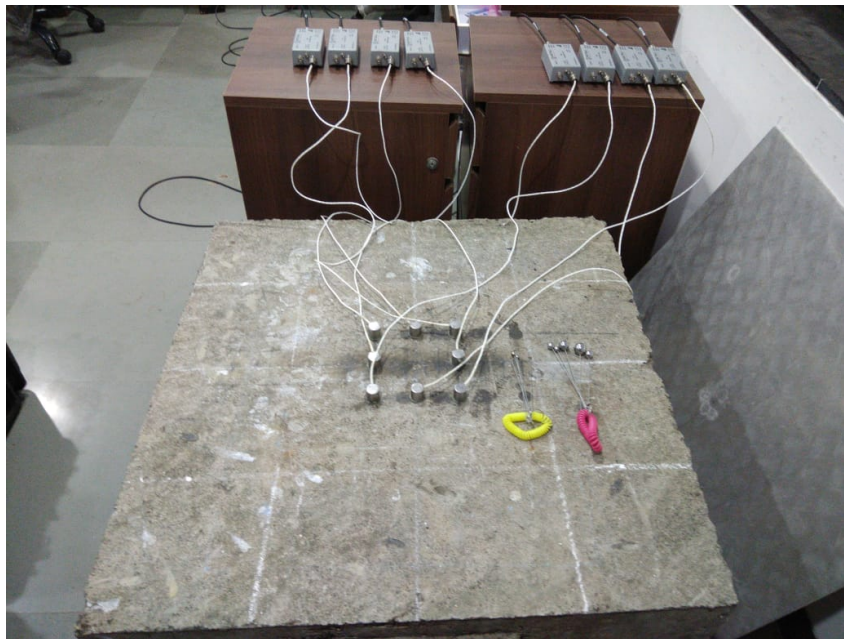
Sensor arrangement for impact echo testing used for void detection in concrete at IIT Bombay, Structural Health Monitoring and Retrofitting Lab.
